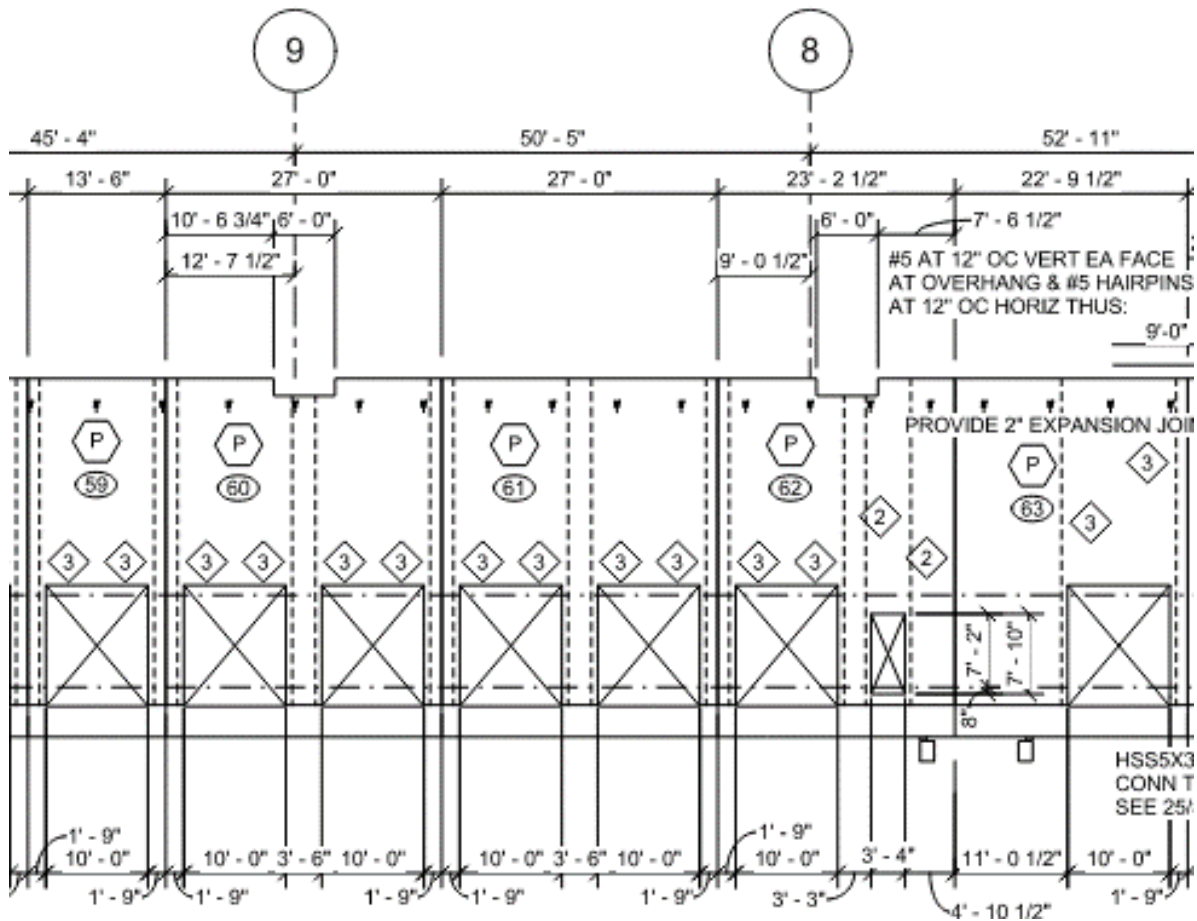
Elevation of loading dock area from structural drawings; Note dock door openings
